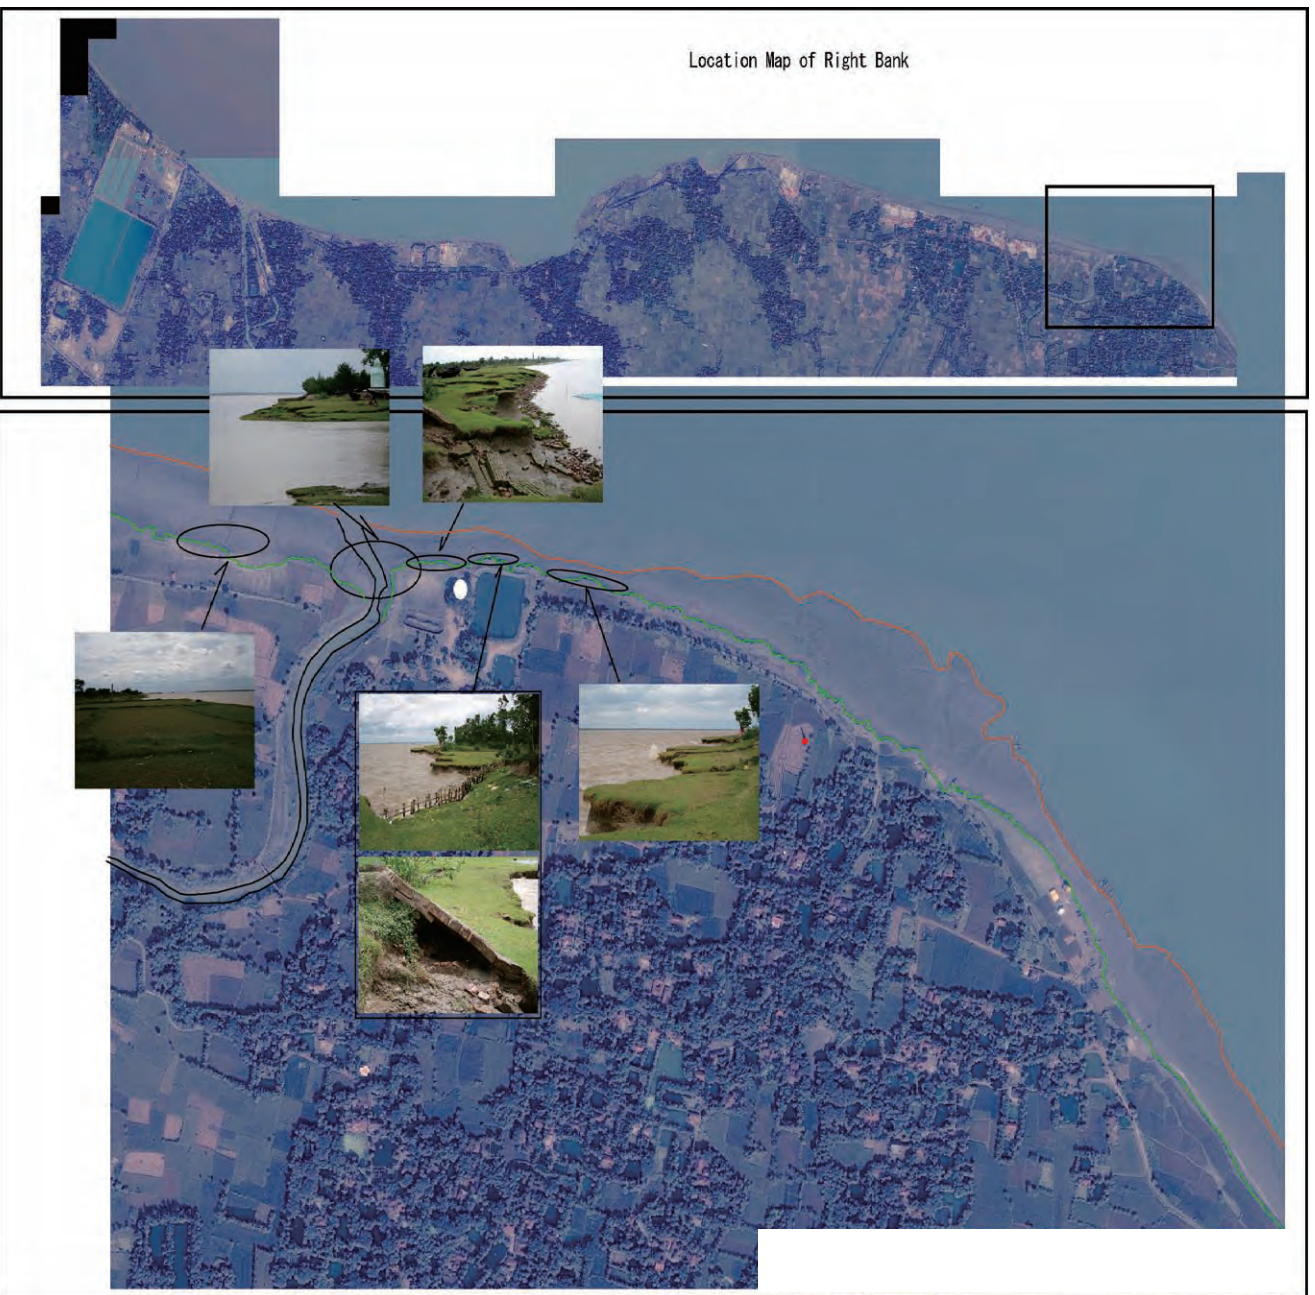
River Bank Protection Works at Right Bank (5/5)
